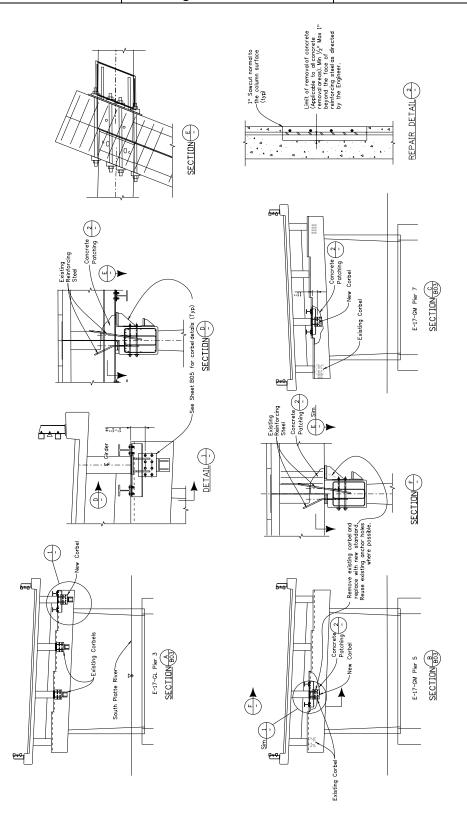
(F)-2 Sample Sections and Elevations for Corbel Placement
